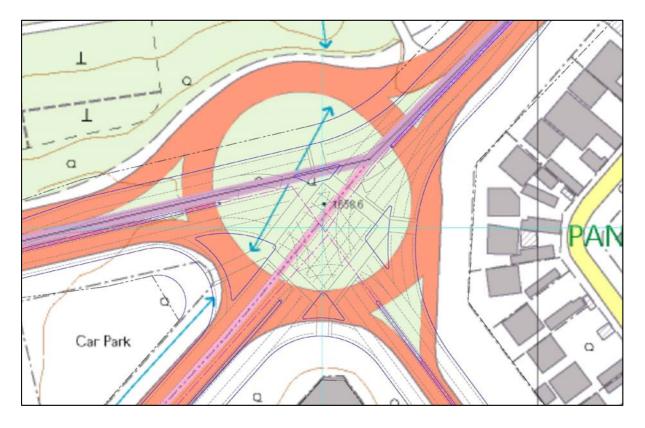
JUNCTION IMPROVEMENT PLAN AT MURANGA RD. W/ FOREST RD.-2
